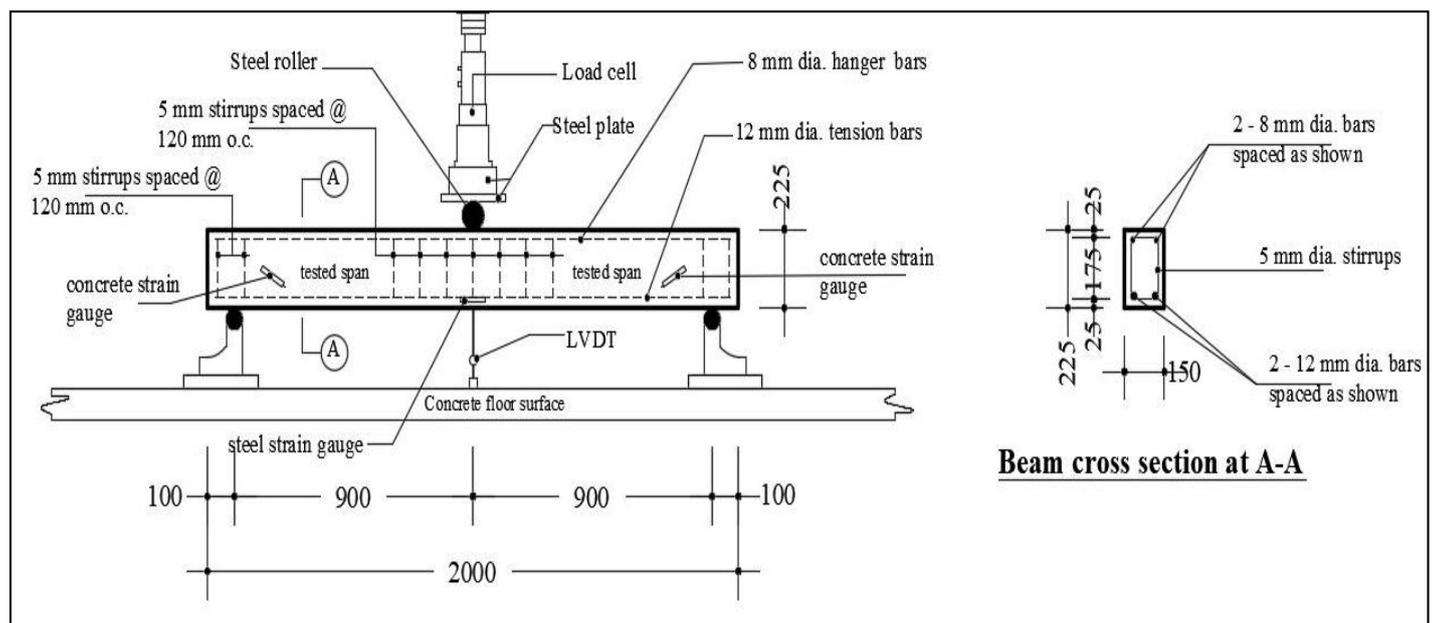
Experimental setup and reinforcing bars details for Beam-I and Beam-II specimens
